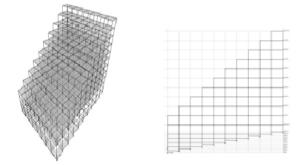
3-D View and Elevation of Set & Step back building for Storey 10 (10°Slope)
